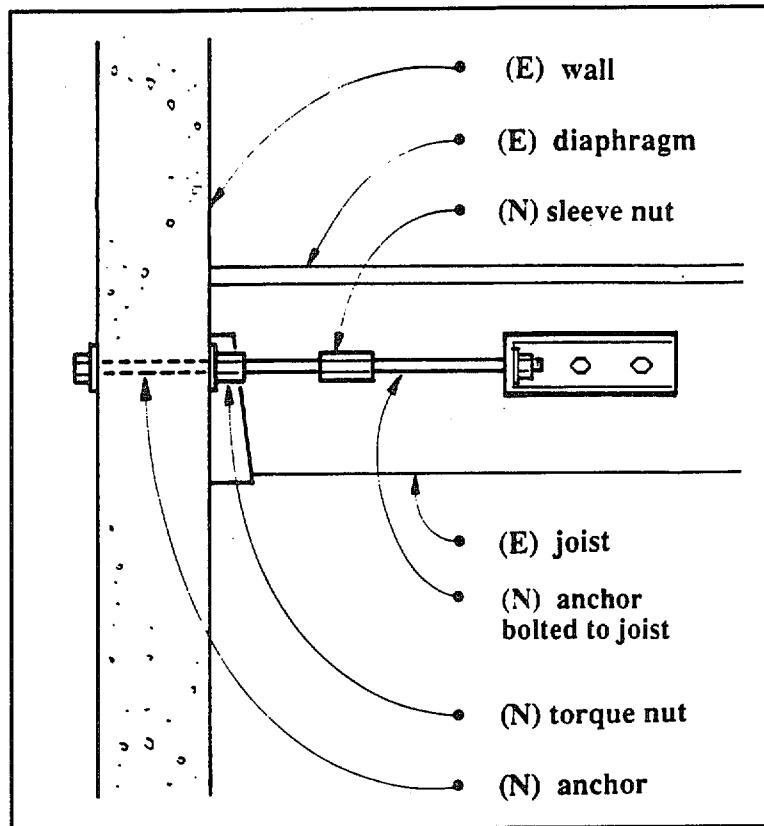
Strengthening out-of-plane connections of a wood diaphragm.
